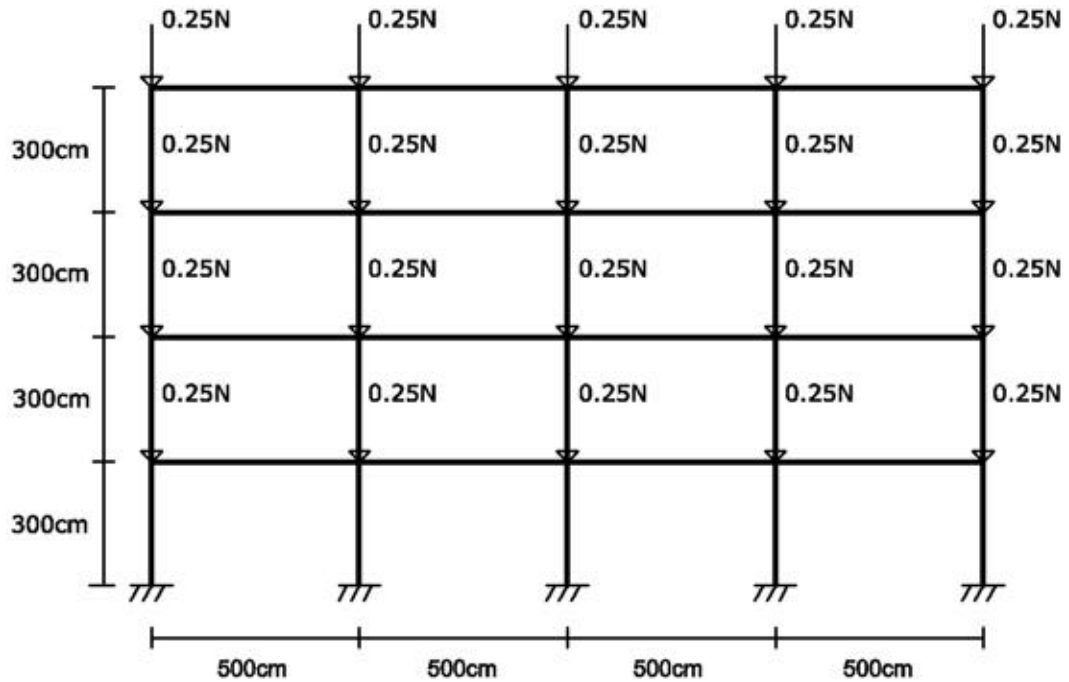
Geometry of the Structural Frame without Shear Wall
